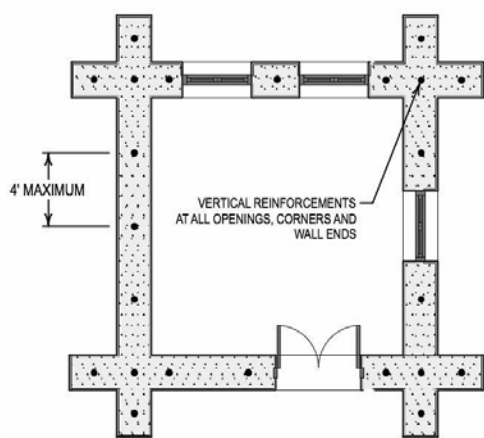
Corner Reinforcement Using Pier (Hart, K. & Geiger O. (n.d.)).
